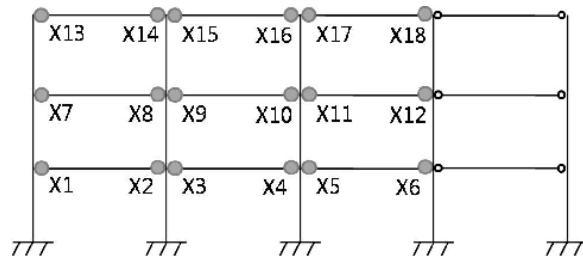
Elevation diagram of 3-story example and the positions where retrofitting is possible
